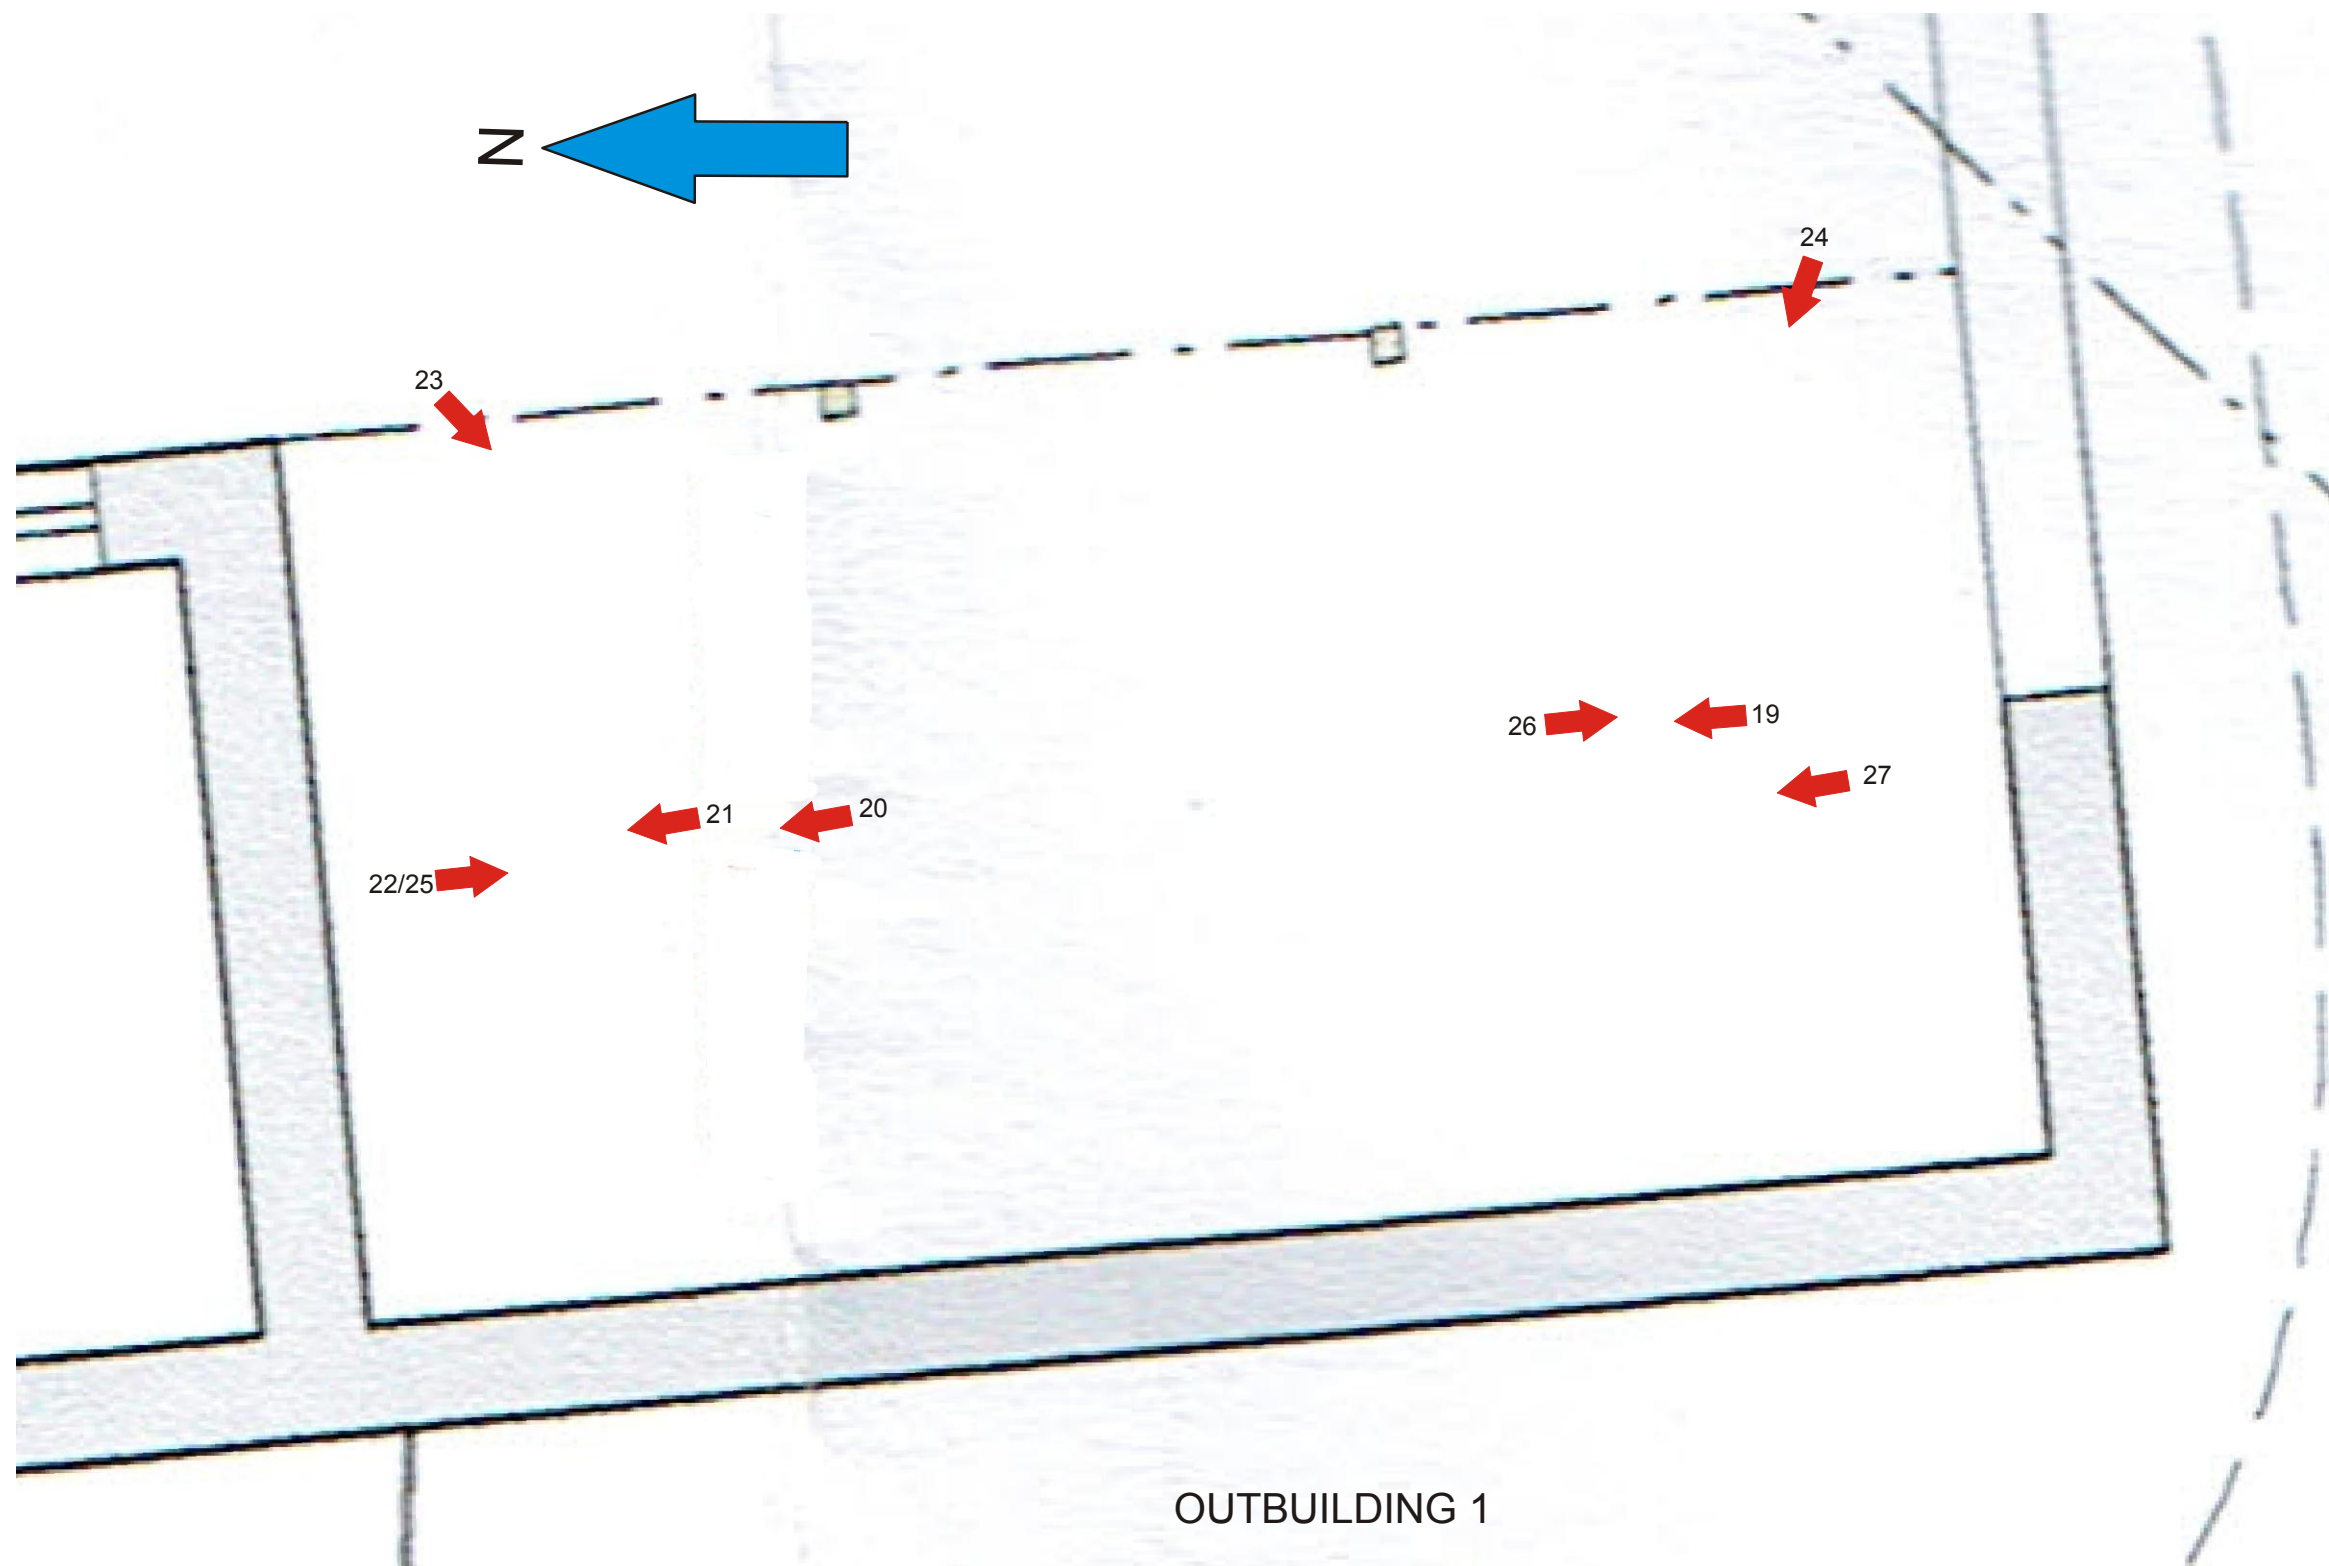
Plan showing the layout of Outbuilding 1, West Range, Unit 2, and showing the directions from which the various images (19-27) were taken from, (not to scale)
